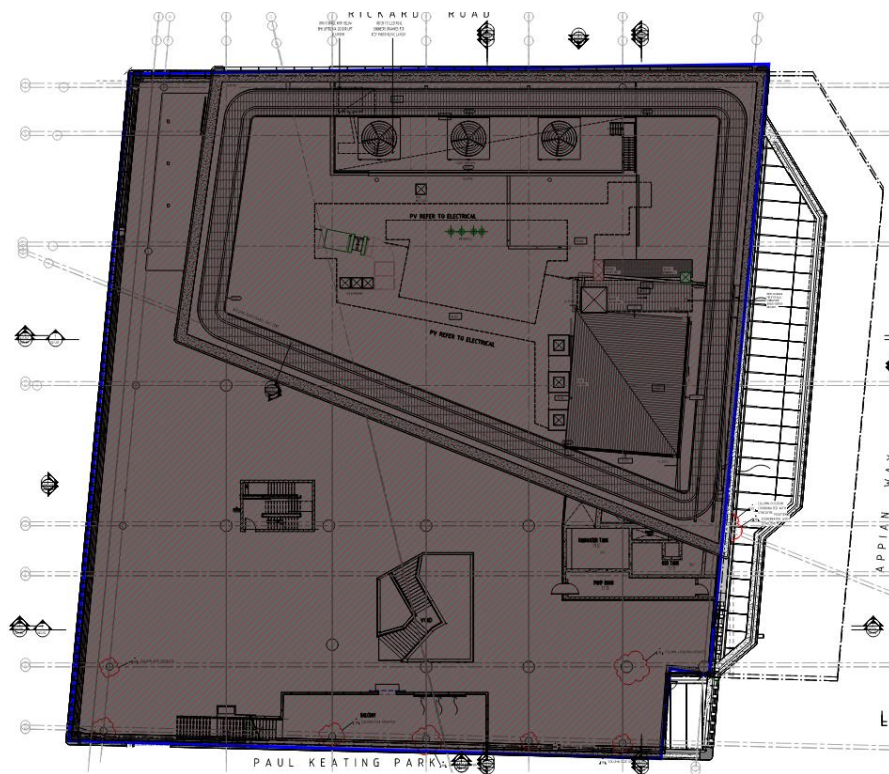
Combined Floor Plans for Roof Catchment (Lyons Architects dated 31/07/2020)
